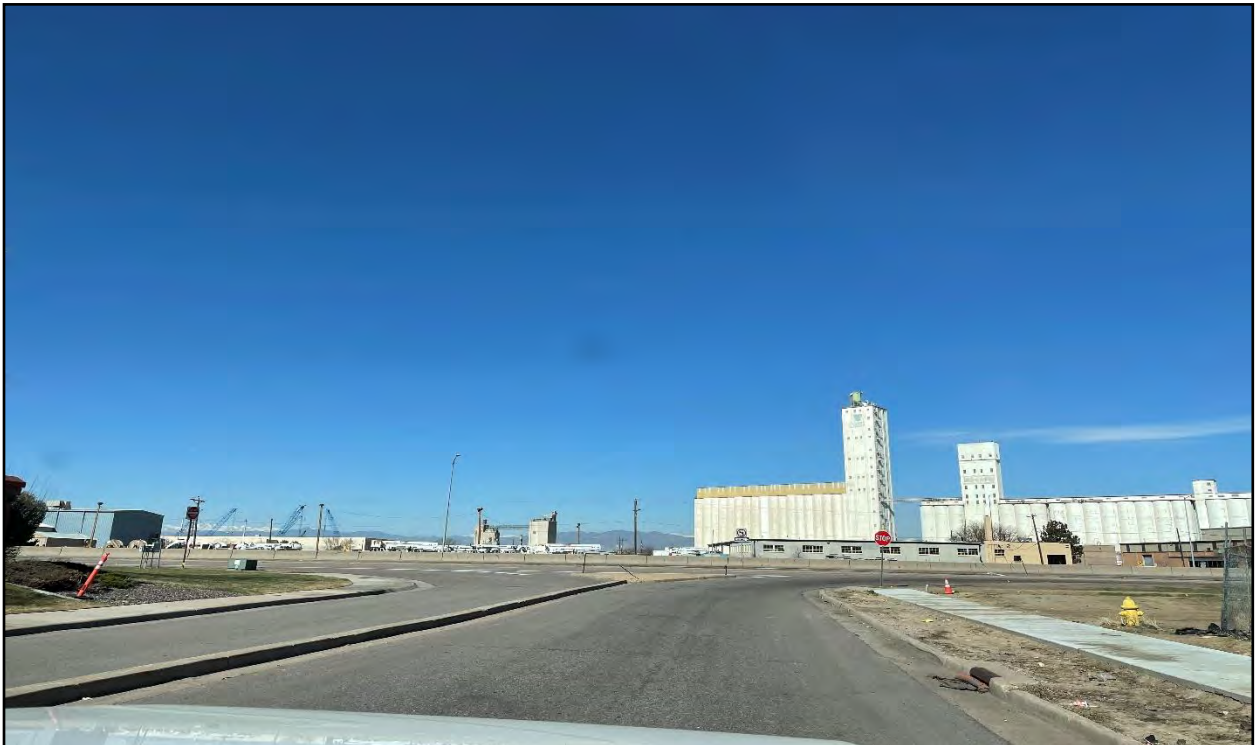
View of the E 62nd Ave, Vasquez Boulevard, and Highway 2 intersection from E 62nd Ave facing west.
